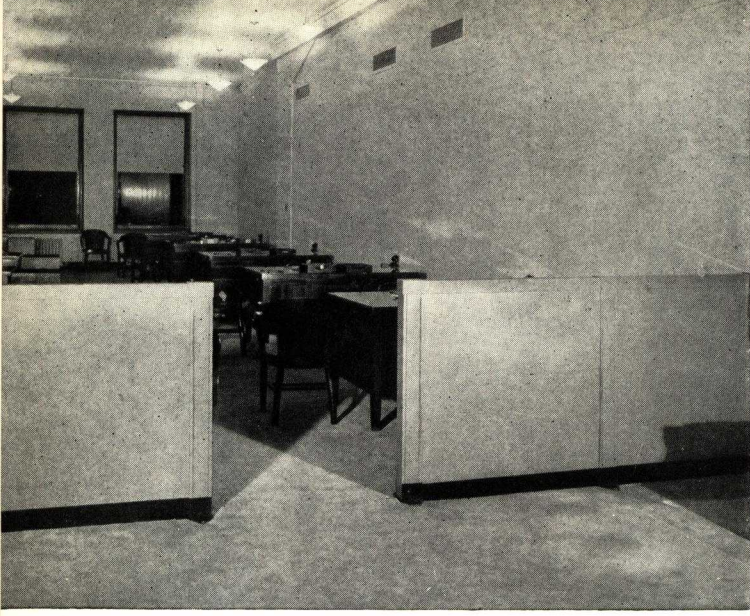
Here a "RFS" flush sound proof wall divides general secretarial department from public space. Air conditioning ducts are readily installed in the top filler
